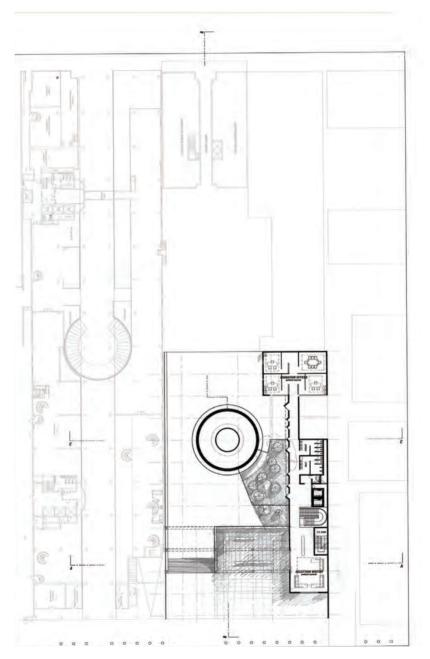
12 - Ground Floor Plan NTS (Source: Author. 2013)
